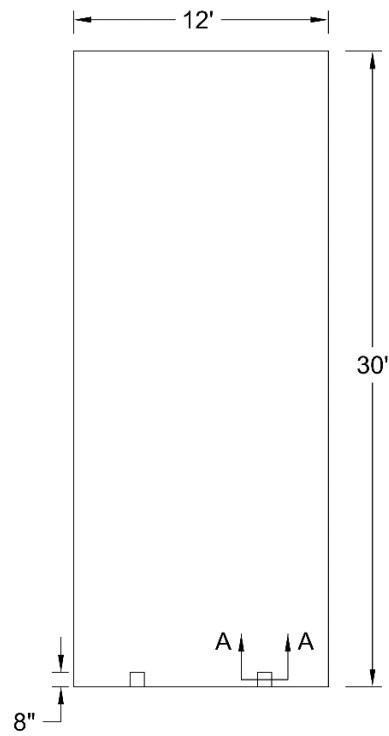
SWP layout of example analyzed with solid sections at foundation connections
